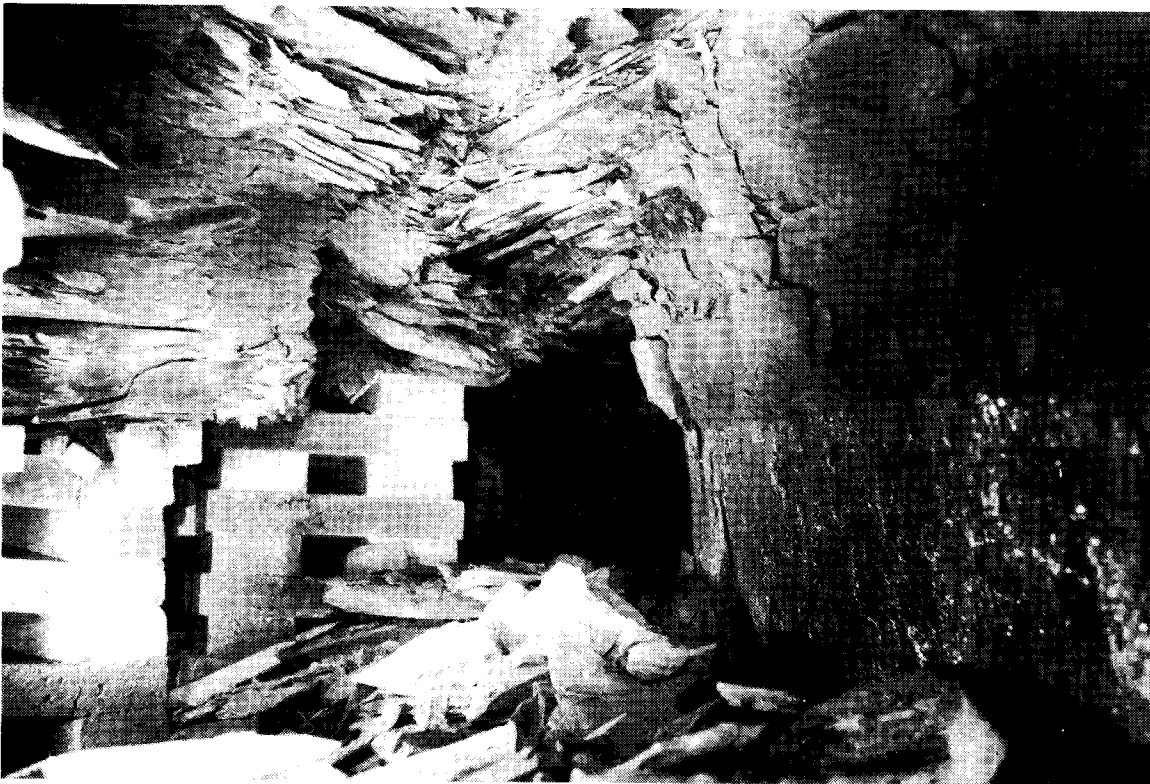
Severe cutter roof failure supported by fiber cribbing.
